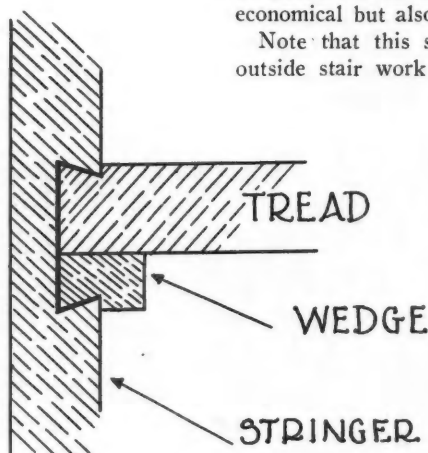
When the Wedge Is Driven Under the Tread It Forms a Joint Similar to a Dovetail.
